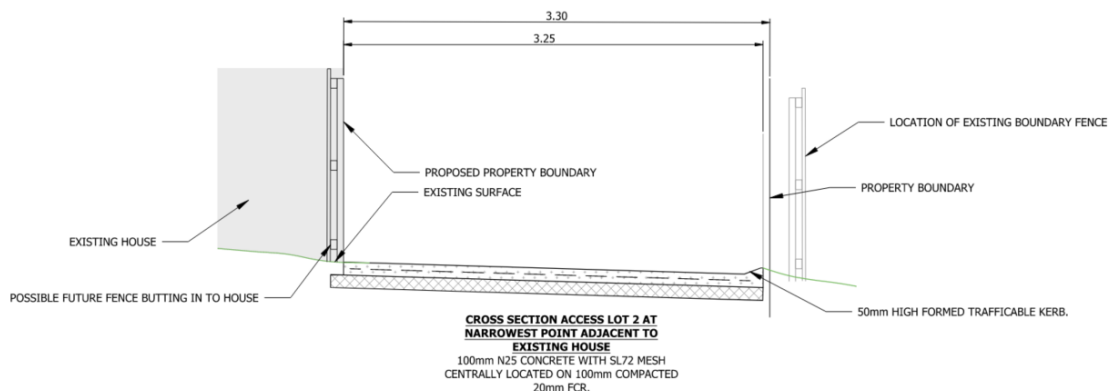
Cross section of access for lot 2 at narrowest point (Source: extract from subdivision plans sheet 5 of 8)
